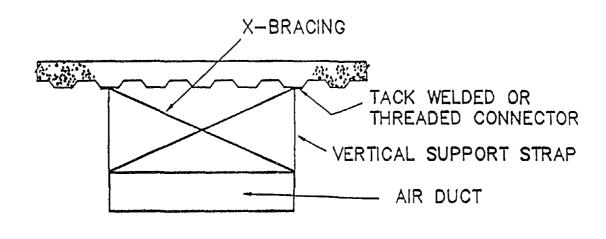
Typical Anchorage of Air Handling Equipment
